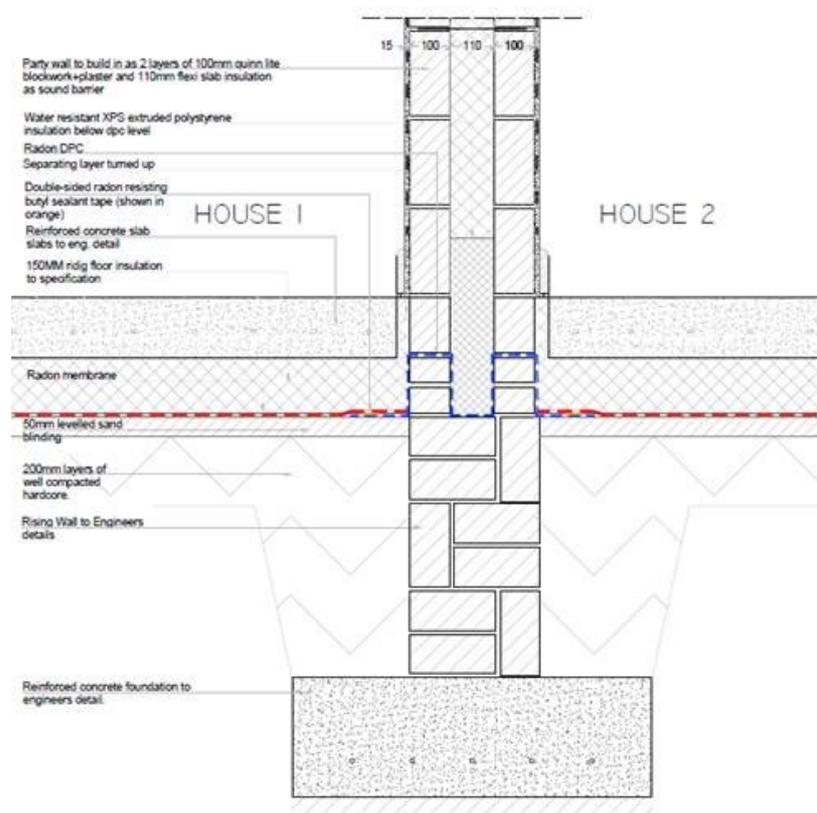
Typical party wall base detail with typical ground bearing slab
